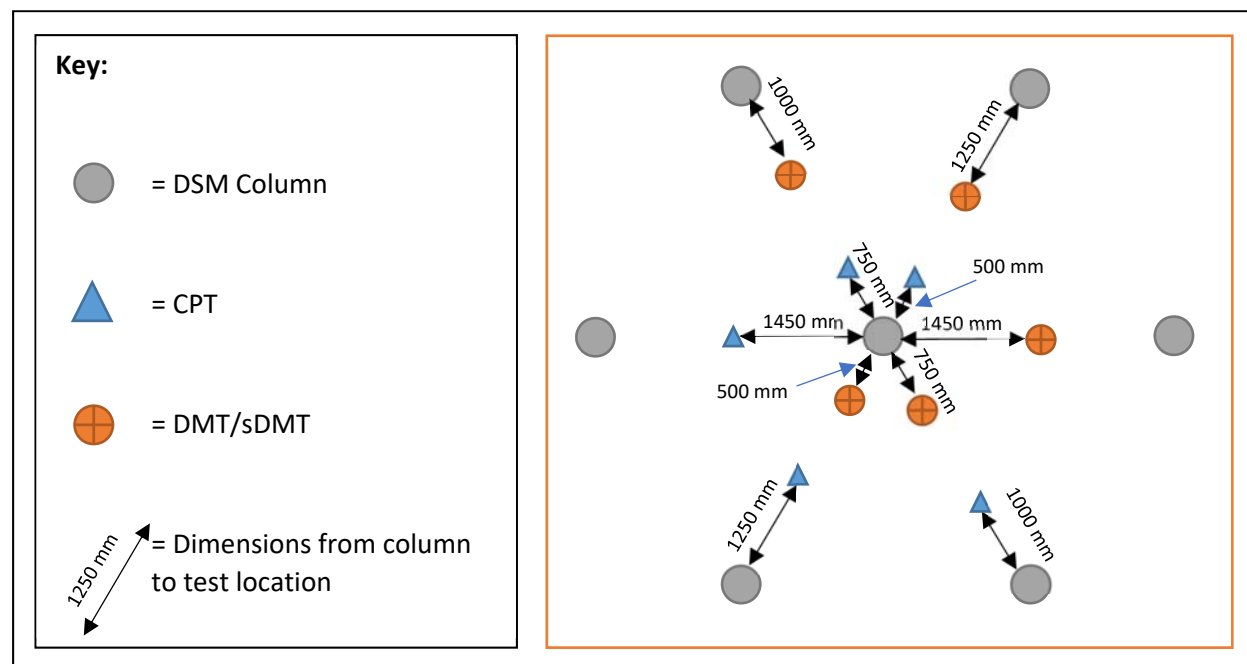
Testing Panel with Layout of Test Locations Relative to DSM Column
